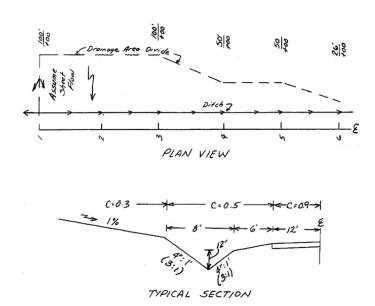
Roadside Ditch Protection Sample Problem, Plan and Section
